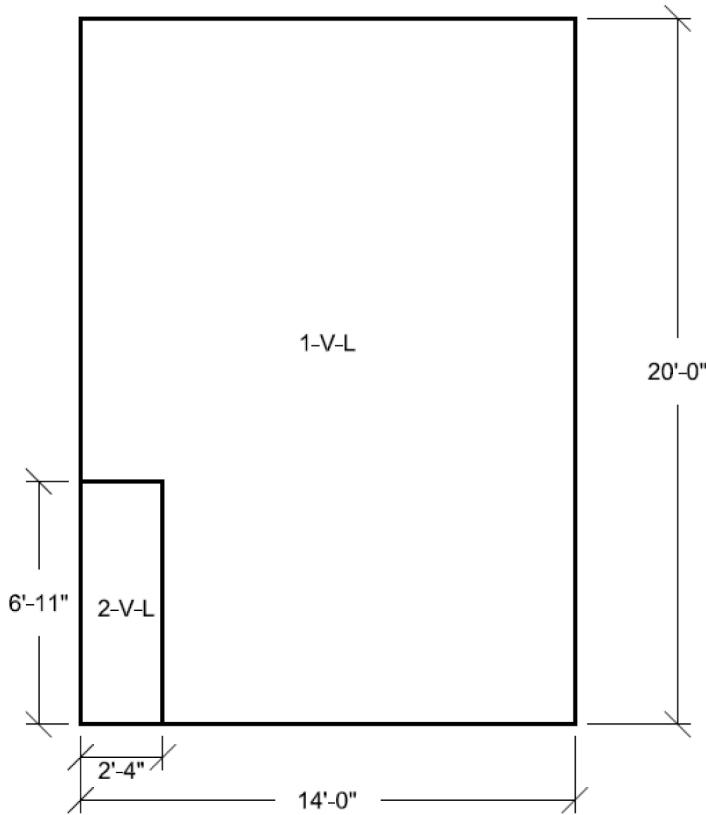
H.6-176A DGFO SV Wall 9 Looking From Outside Vertical Reinforcement Zone Far Side Face
